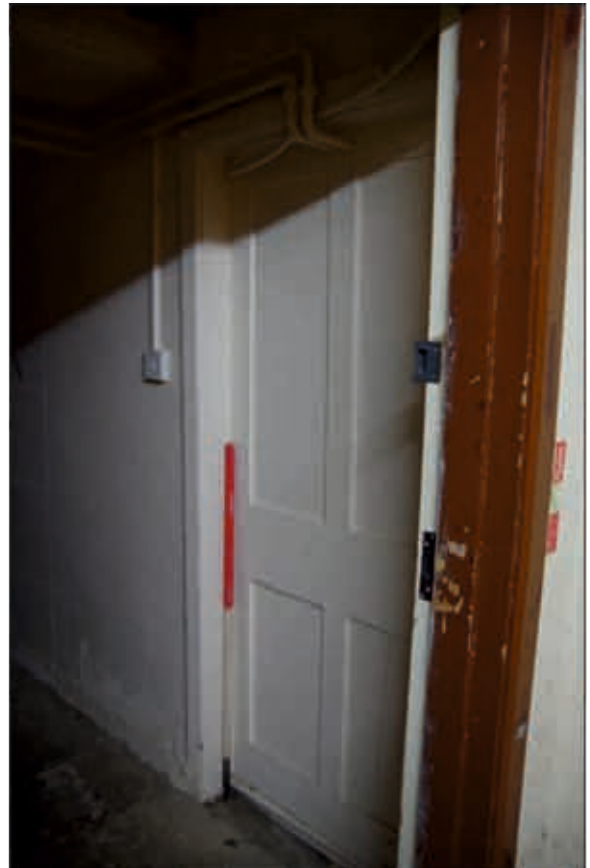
Blocked doorway containing 4-panel door in the corridor on the ground floor of the infill building, looking southeast (1m scale)
